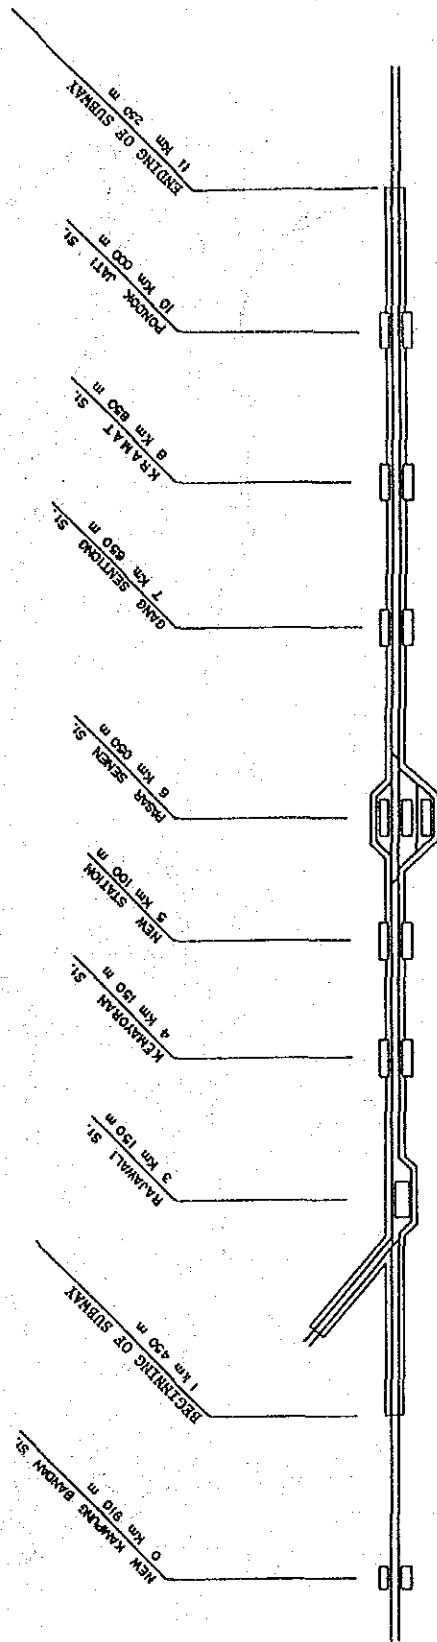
Track Layout Plan for Subway of E/L
